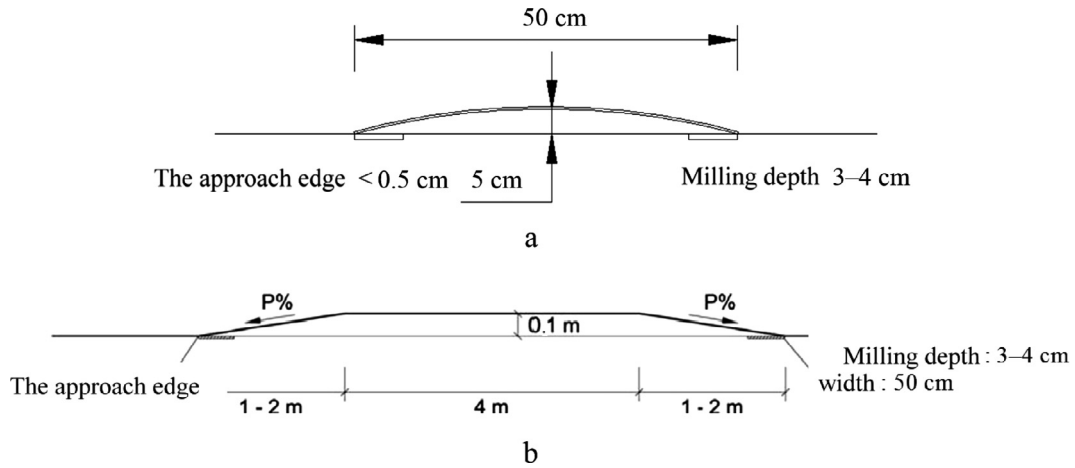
Structure of prefabricated plastic speed bump (a) and raised trapezium-shaped crosswalk (b).
